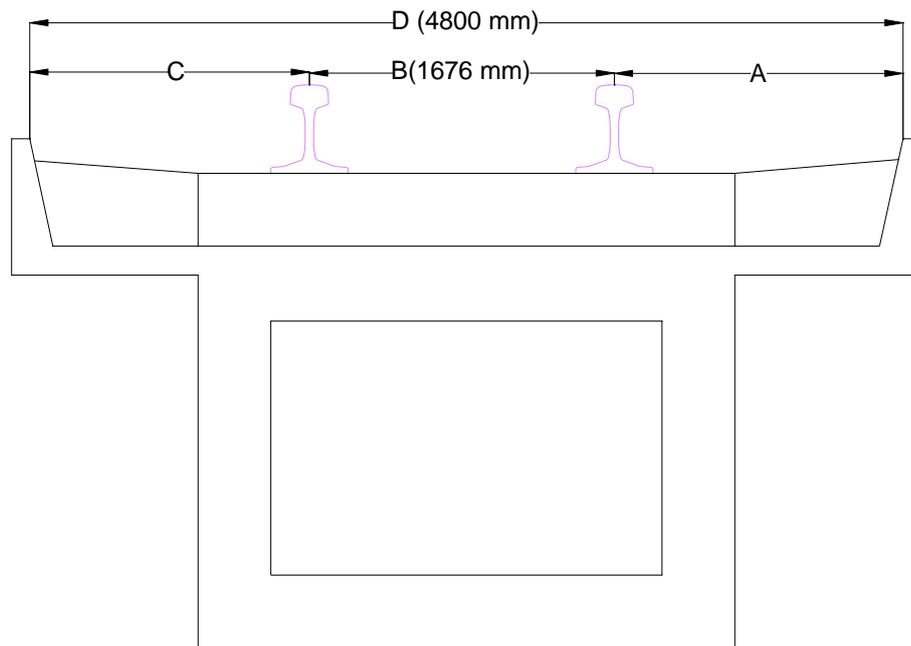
Cross section of rails for PSC Girder Bridge 1377A
